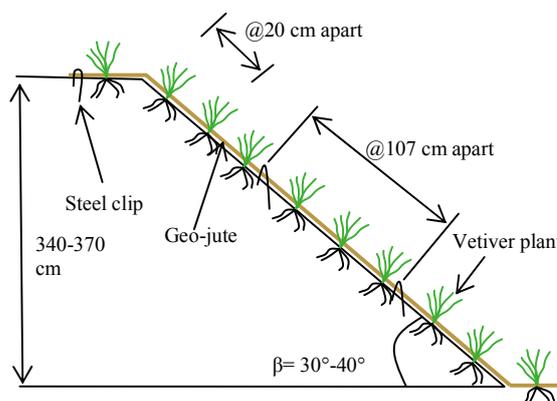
Schematic diagram showing the placement of geo-jute and vetiver plantation on the embankment slope
